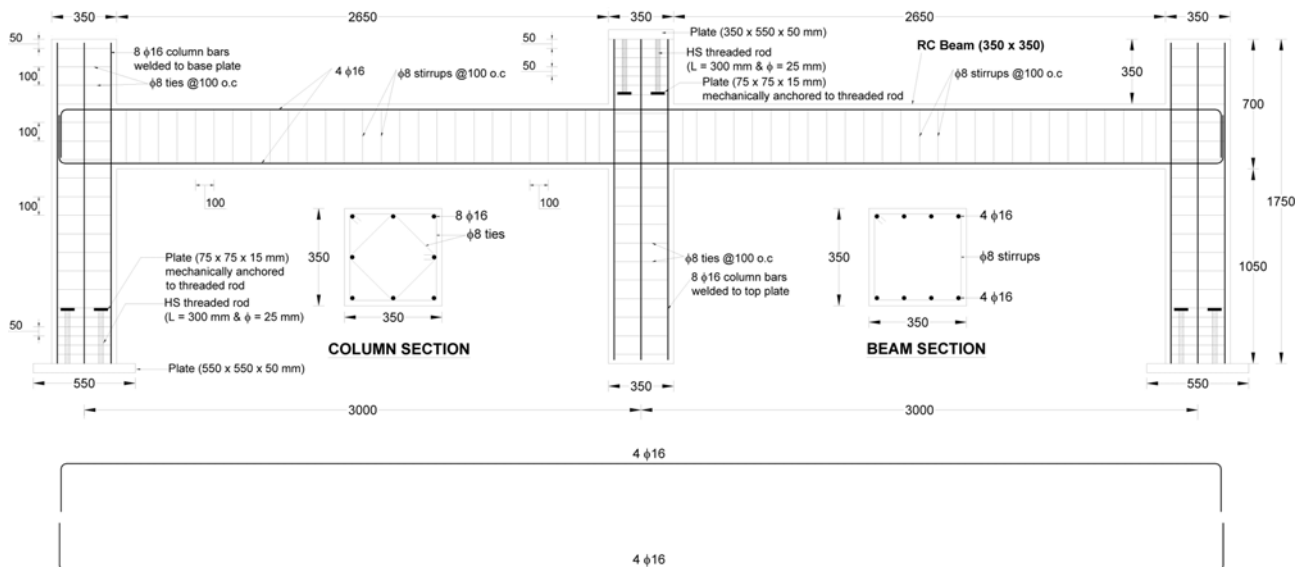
Details of Monolithic Specimen MC-SMF (Note: All dimensions are in mm)
